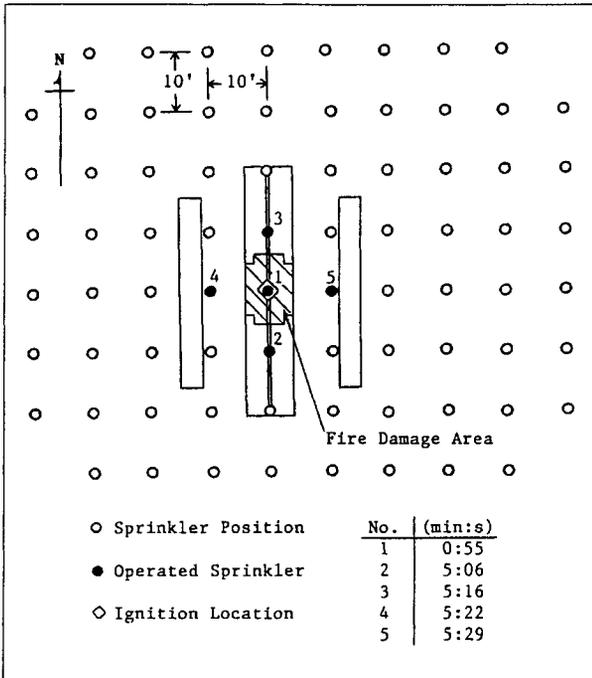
Sprinkler Operations and Overall Extent of Fire Damage - Test 8.
